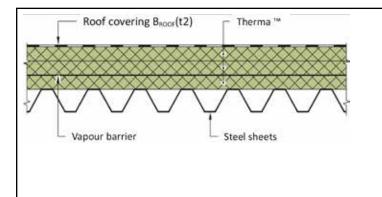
Kingspan Therma $^{\text{TM}}$ insulation boards on steel sheet roofs
